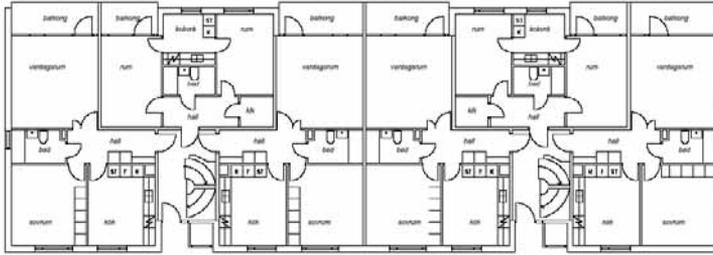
Floor plan of the multifamily house at Brogården (efem arkitektkontor).
